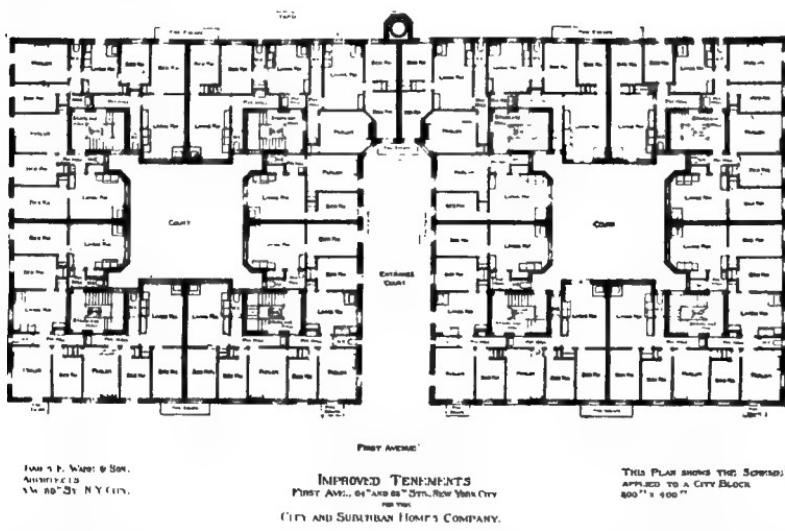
FLOOR PLAN OF MODEL TENEMENT HOUSE.
